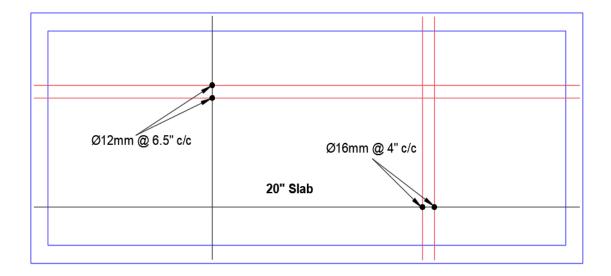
Reinforcement details of bottom slab of the underground water reservoir.
